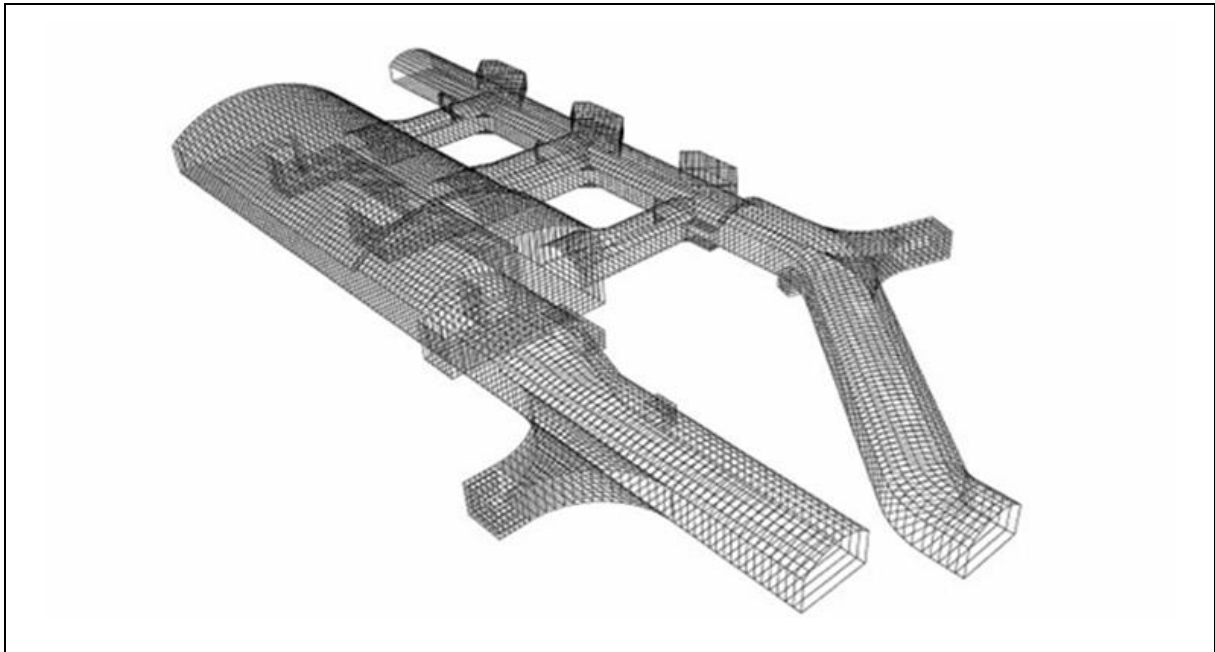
Layout of Island West Transfer Station (courtesy of ARUP)
